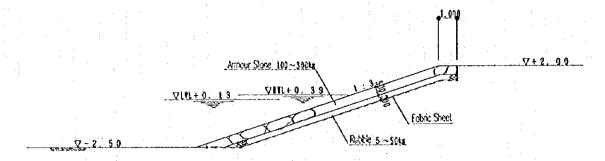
4- 26 Standard Cross Section of the West Revetment
